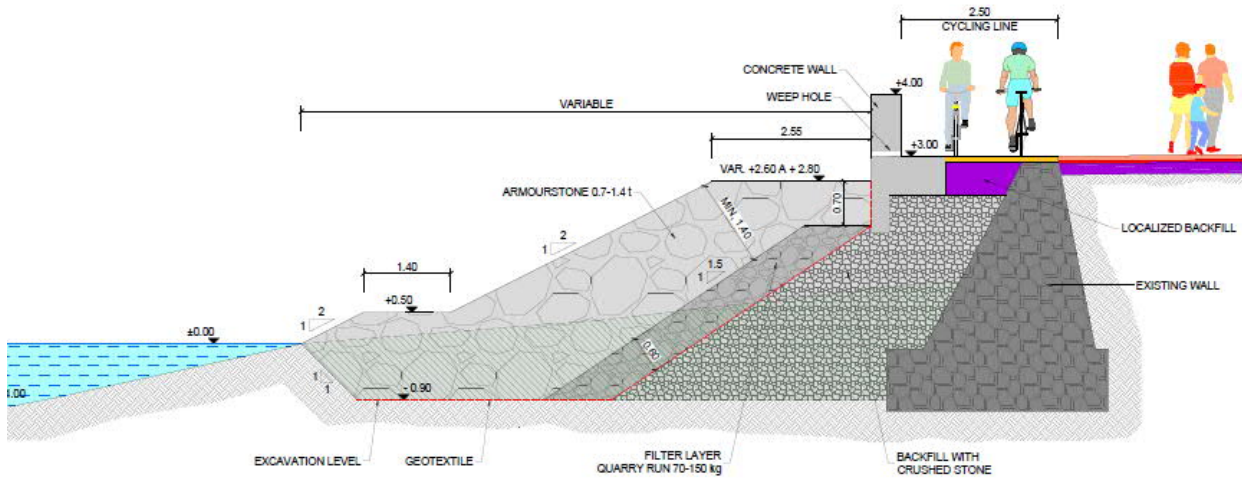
Typical cross section Z2D. Ana Chaves Bay
